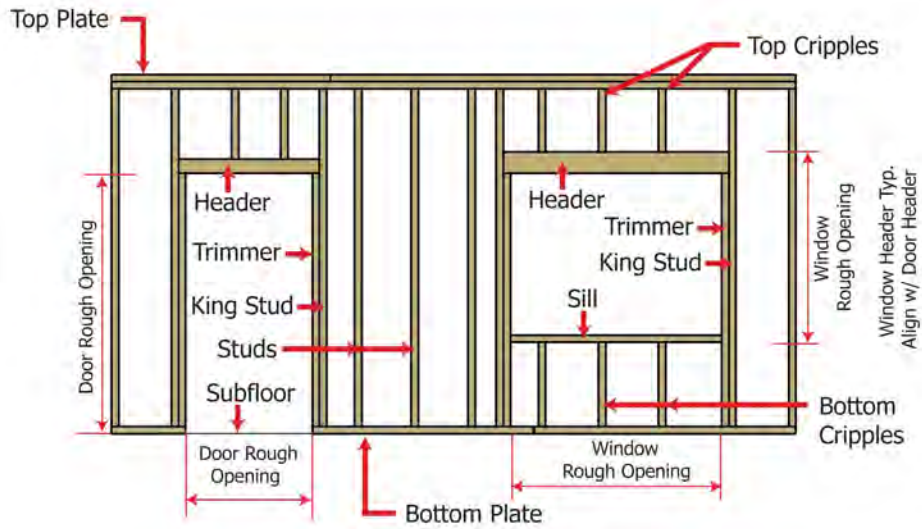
Geometry and components of a light timber-frame wall.
